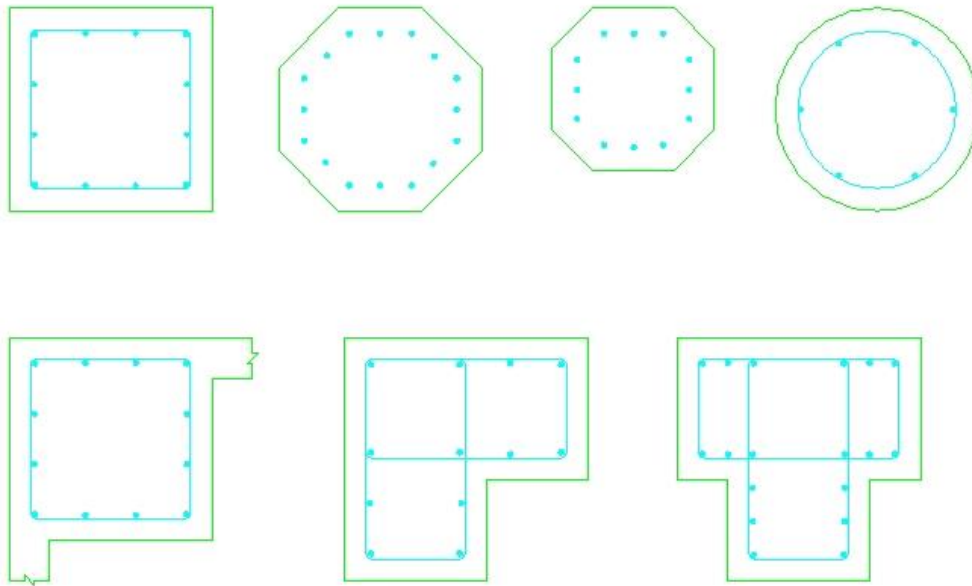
3 Column Section Detailer Horizontal Bar Details
